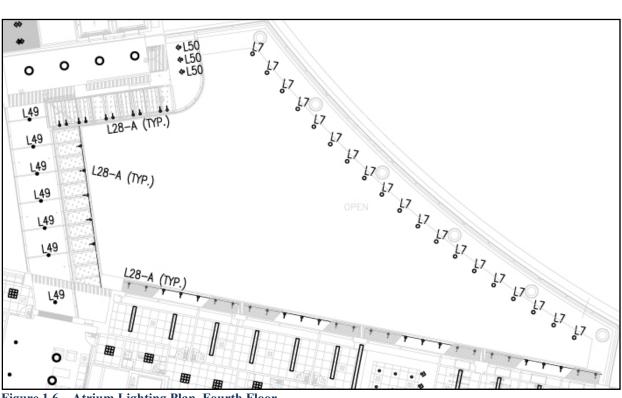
Atrium Lighting Plan, Fourth Floor
